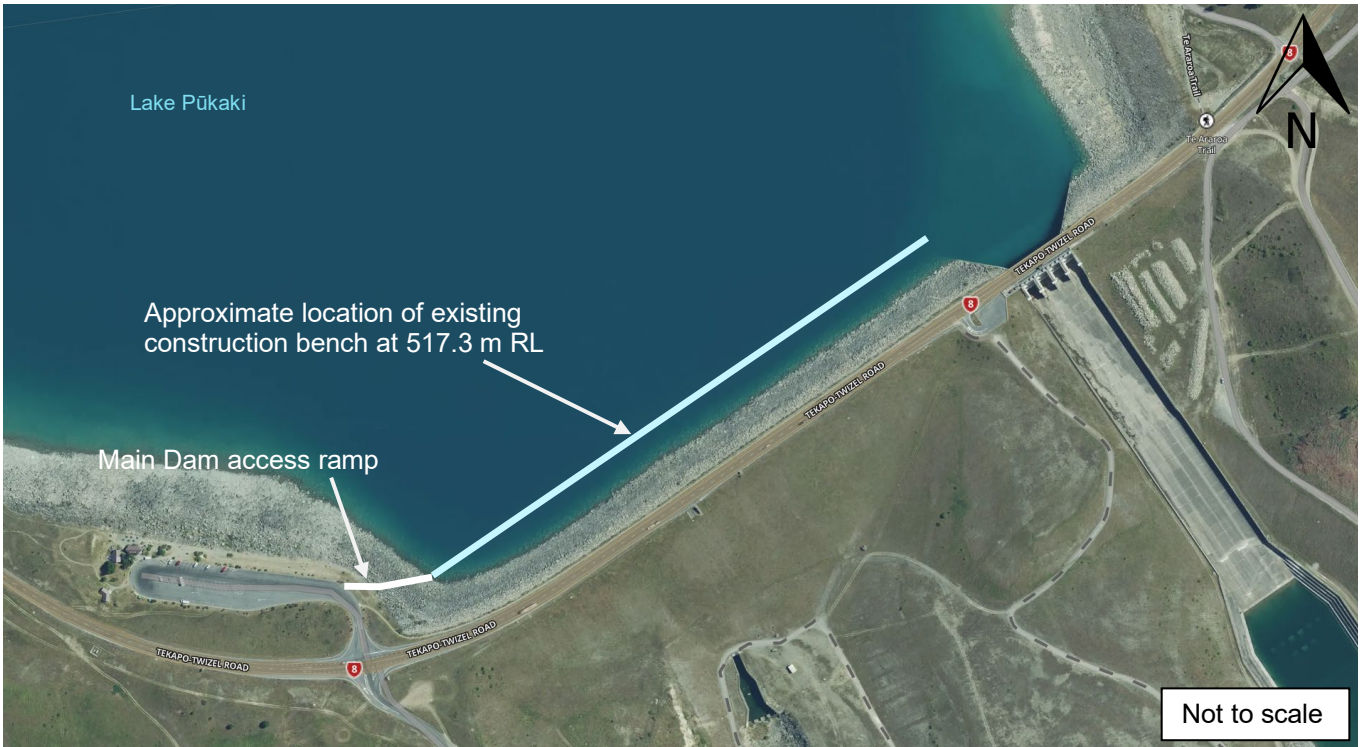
Site plan (Main Dam) – Tranche 1 - indicative 517.3 m RL construction bench
